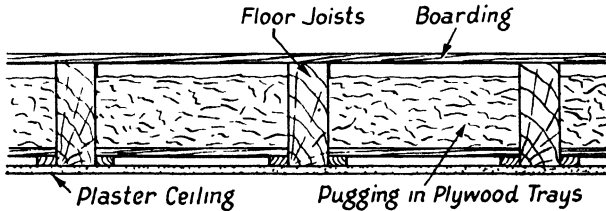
FILLING BETWEEN THE JOISTS OF A WOOD JOIST FLOOR
